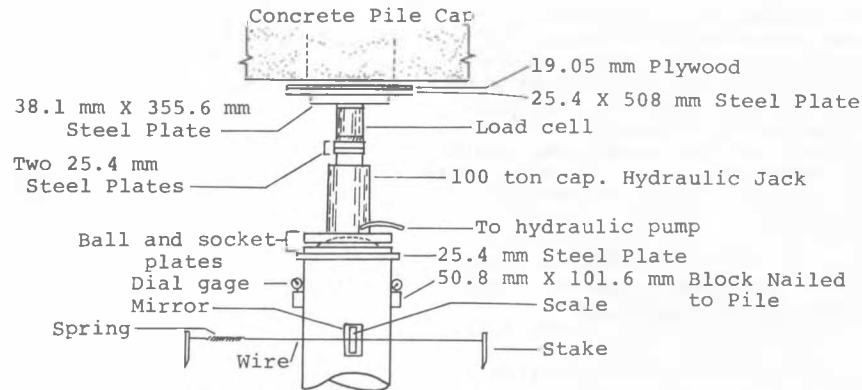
TYPICAL PILE LOAD TEST DETAIL
